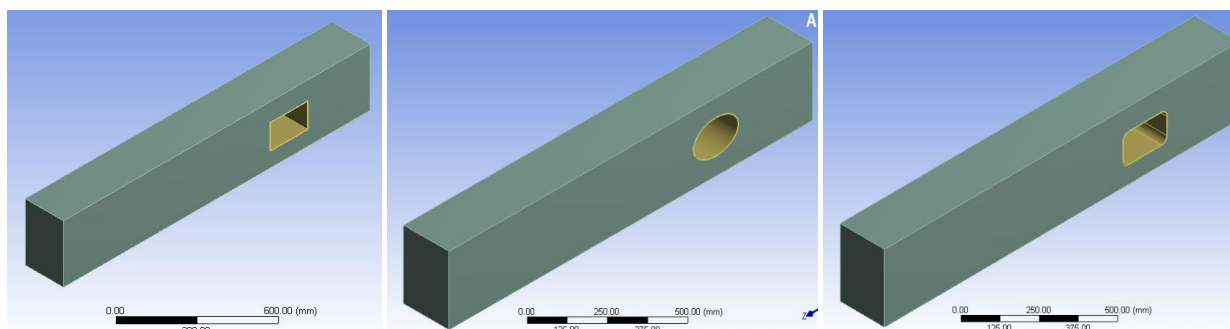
Model of beam sheathed by GFRP having (a) Rectangular opening (b) Elliptical opening (c) Rounded rectangular opening
